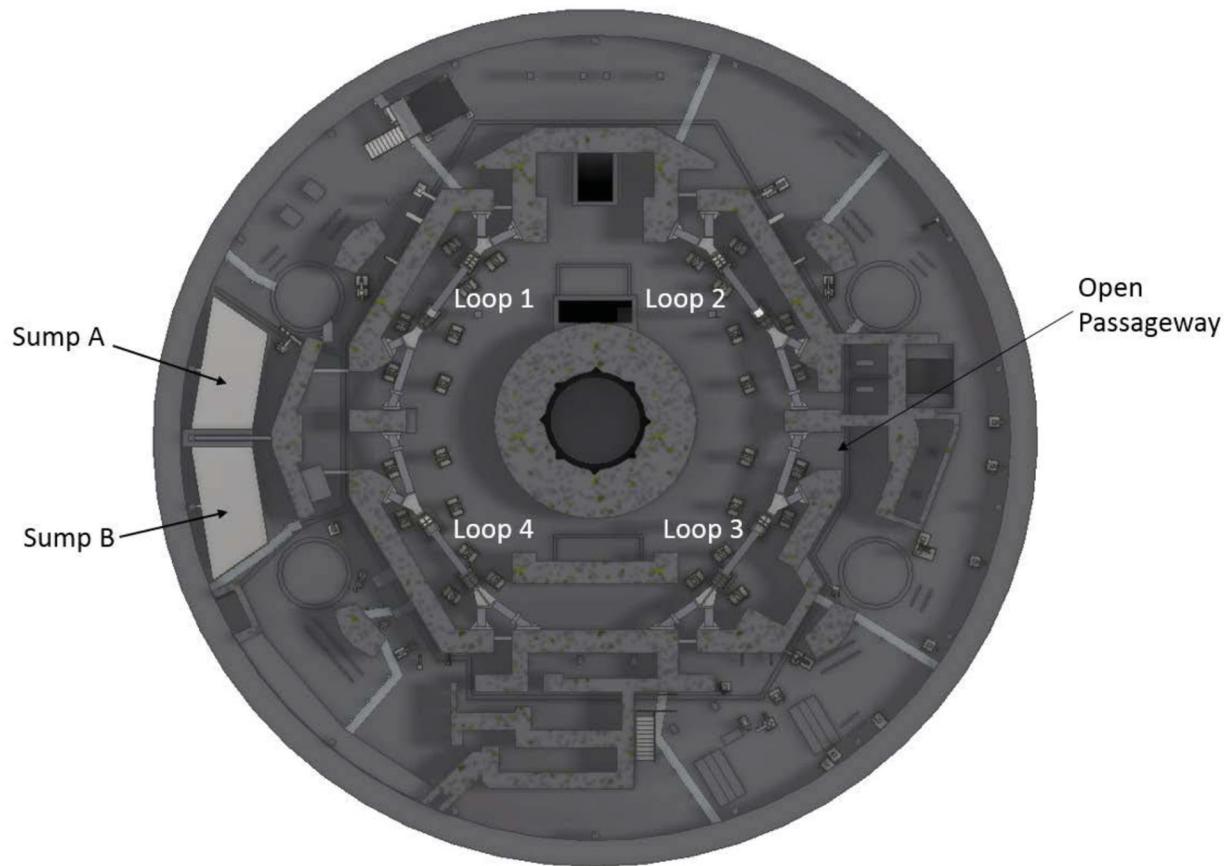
j.1-1: Plan View of Seabrook Lower Containment
